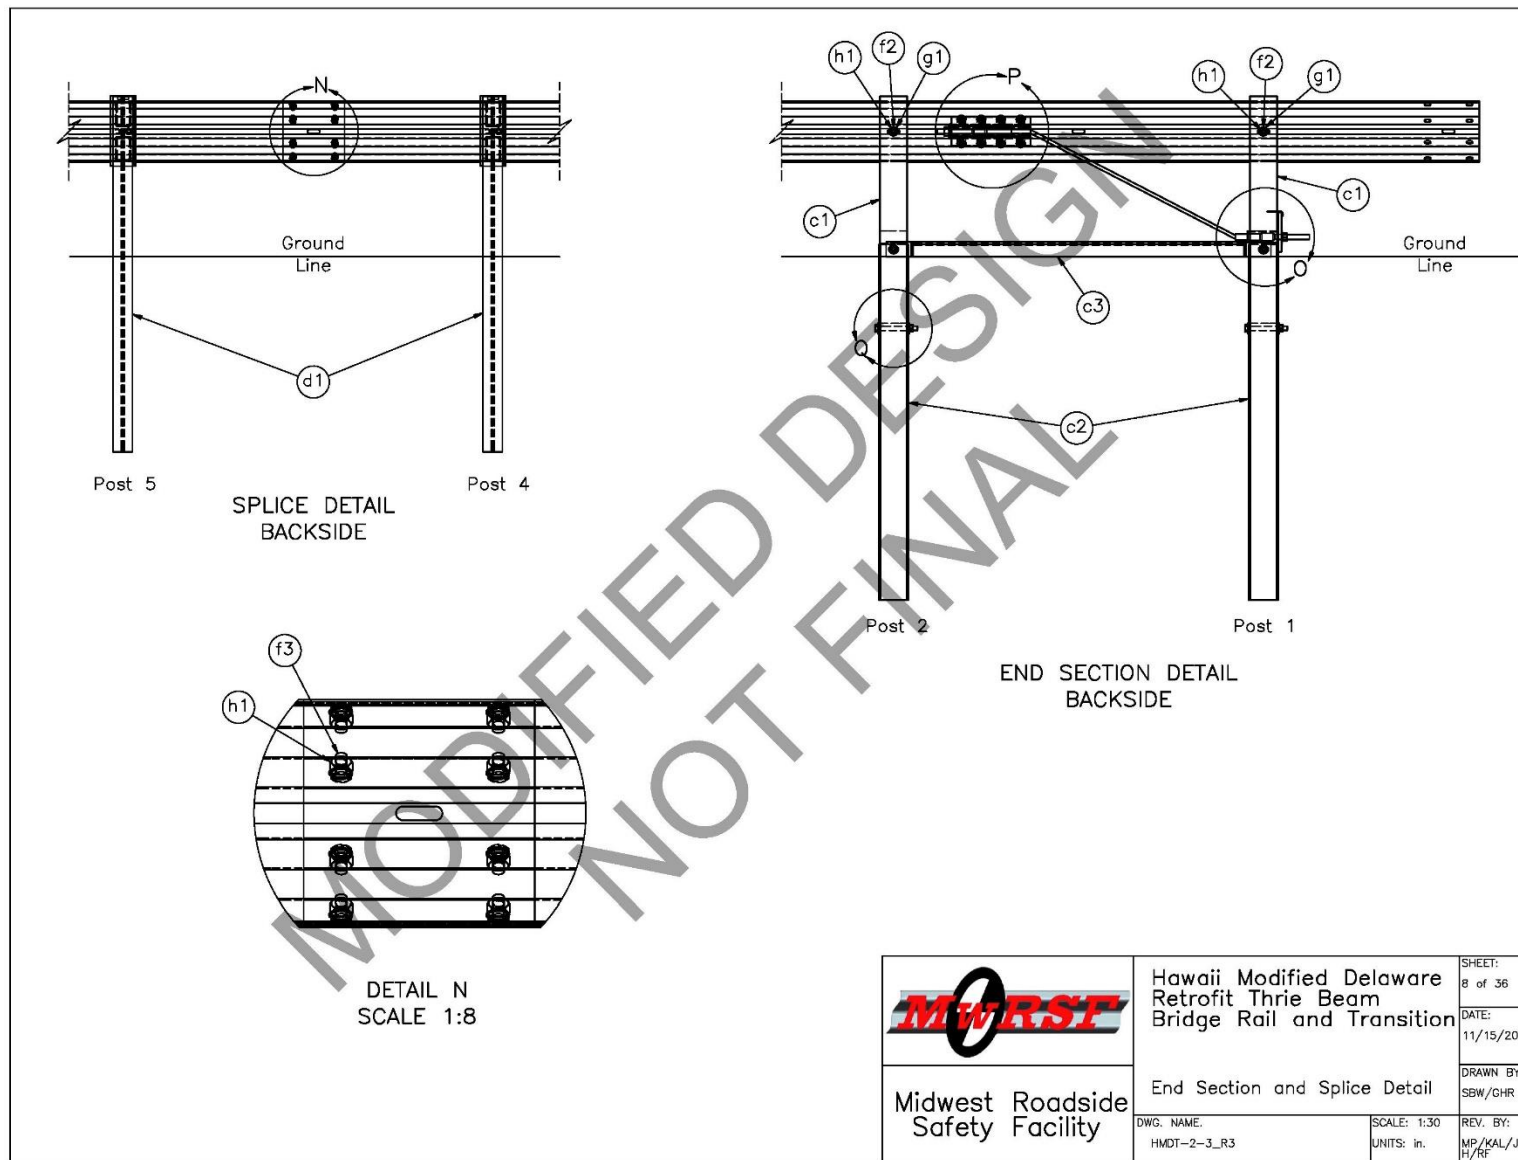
End Section and Splice Detail, Test Nos. HMDT-2 and HMDT-3
